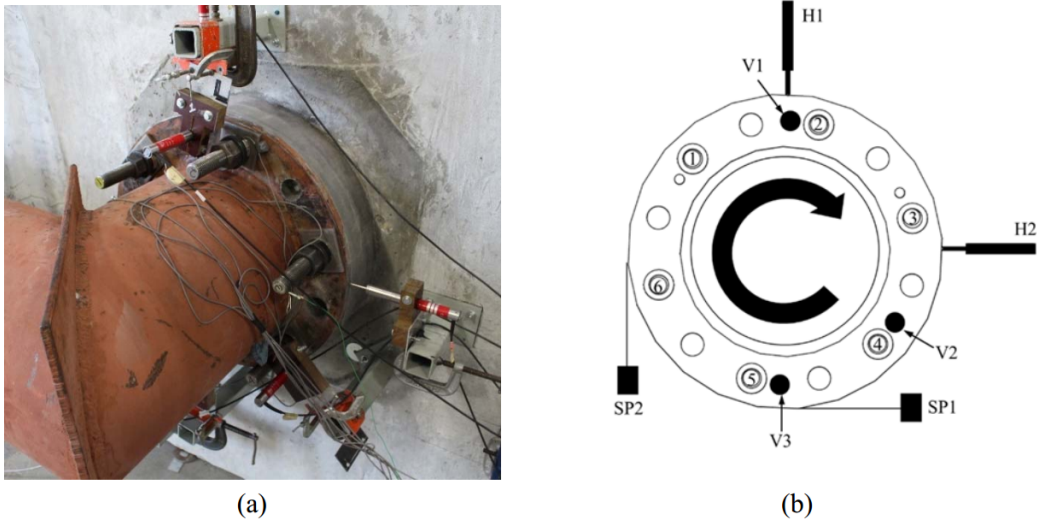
(a) Fully instrumented full-scale specimen and (b) plan view detail of base plate assembly bolt numbers and instrumentation
